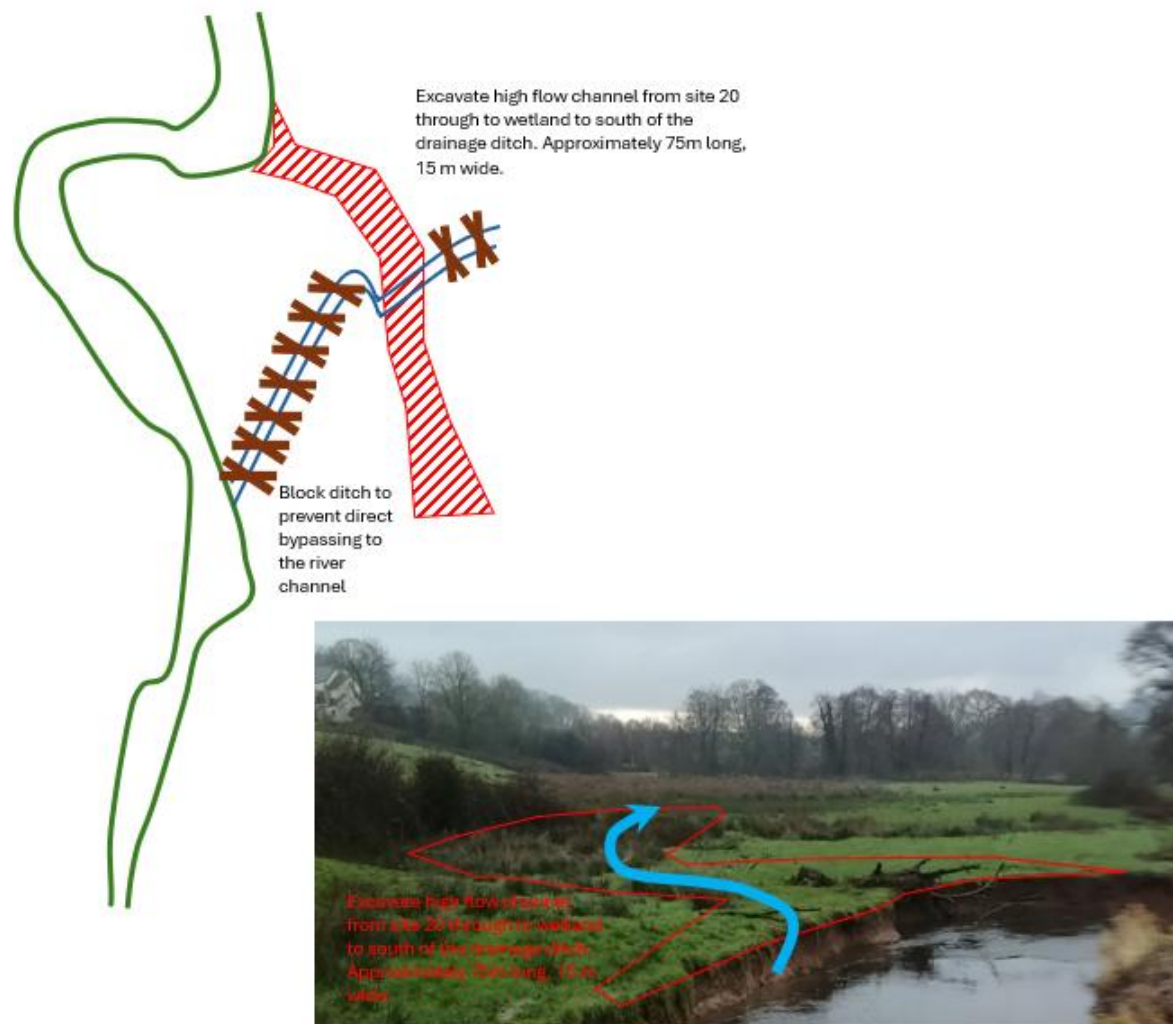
Detailed design drawing showing ditch blocking and excavation.
